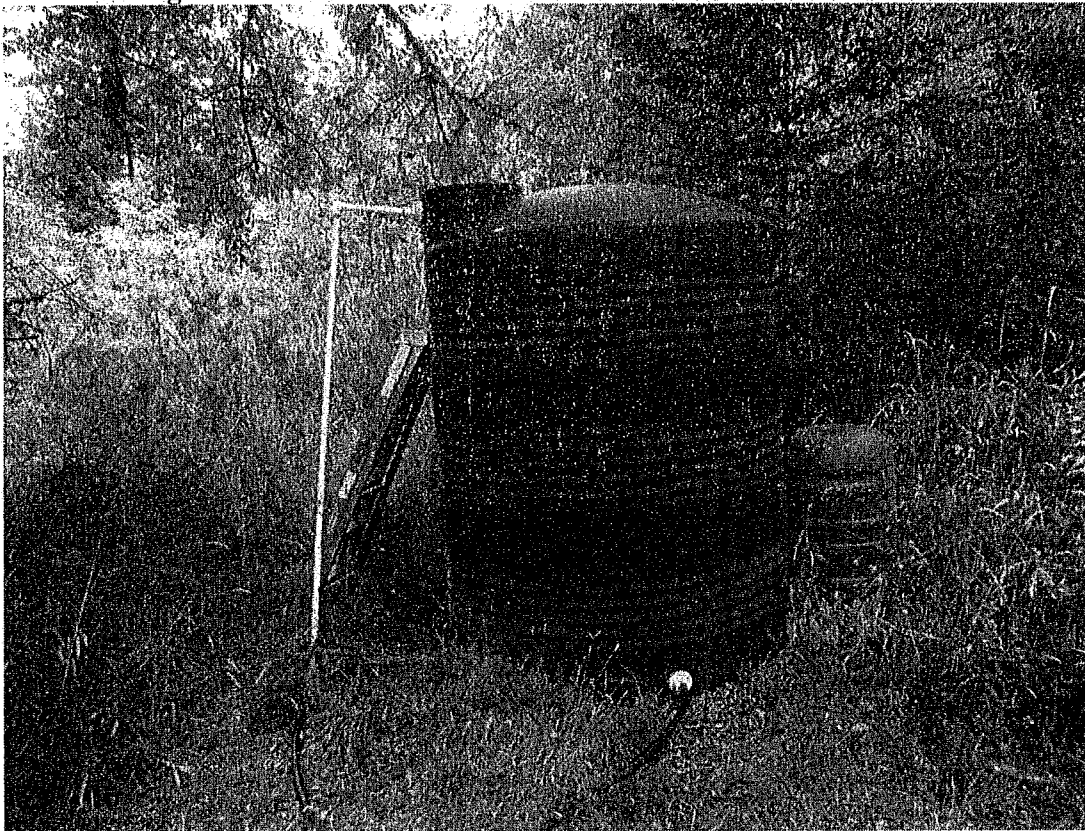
, View of 1,500 gallon water (settling tank) (Photo taken 7/31/18).
